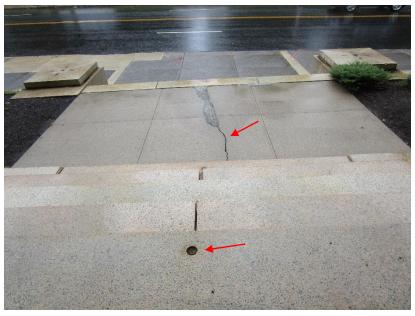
Crack and surface loss in concrete landing at stair to west entrance. Also note sleeve for missing handrail post.
